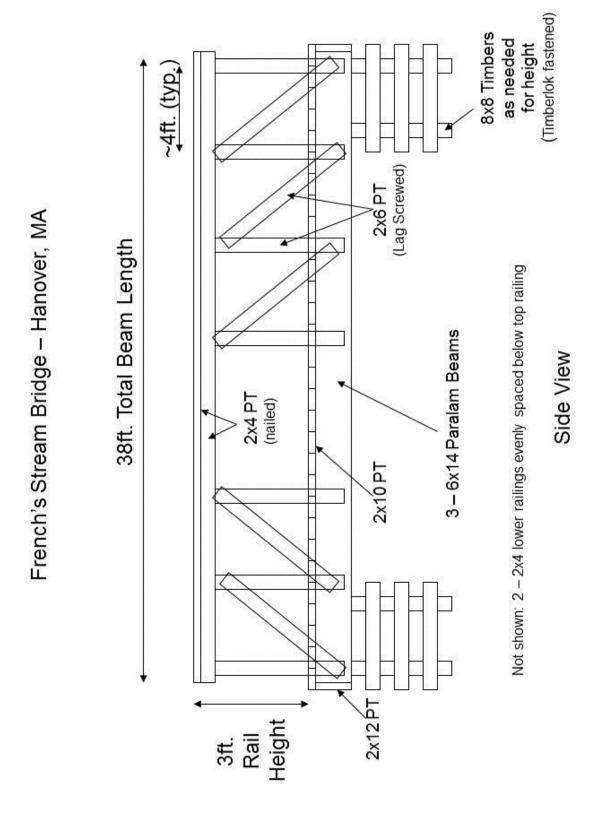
Past bridge design, intended to be used again for the proposed Torrey Brook Bridge.
